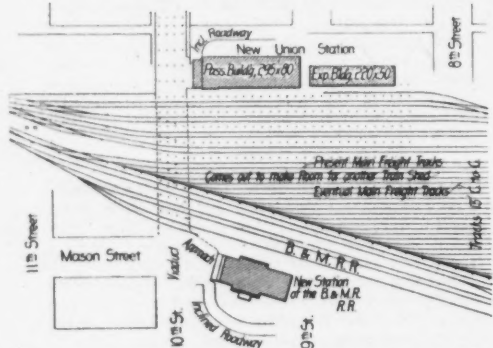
General Plan of Railway Stations, Tracks and Approaches at Omaha, Neb.
